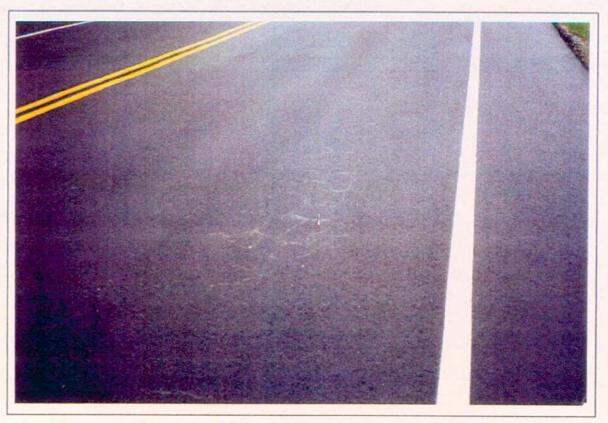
View of alligatoring and slight rutting in outside wheel path of northbound traffic lane at Sta. 403+10 - Sta. 403+90.
